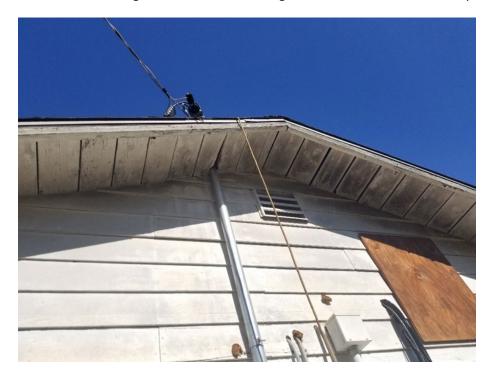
East façade of 1940s portion with ship lap wood siding and front gabled roof, looking northwest. Photo taken on July 9, 2020.
